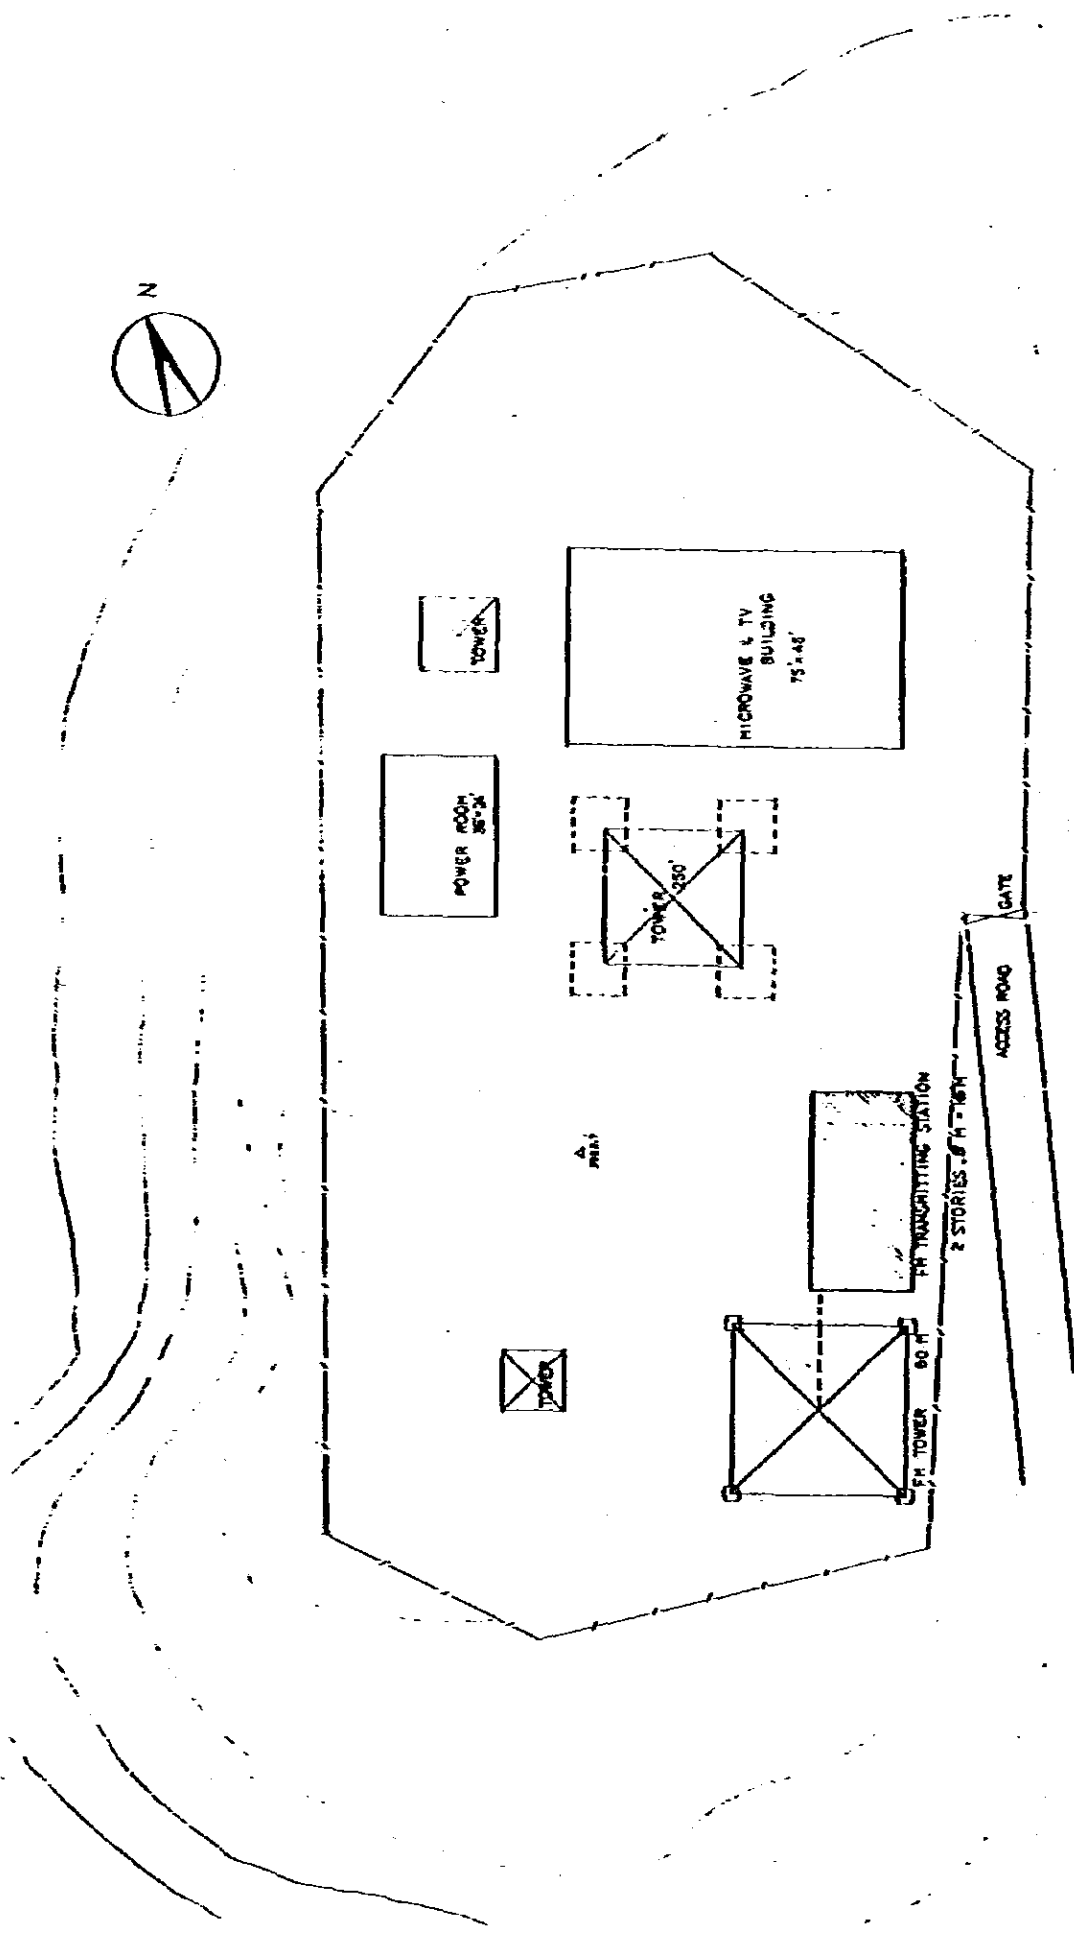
Site Plan -- Bt. Telepa Burok, N.S.
